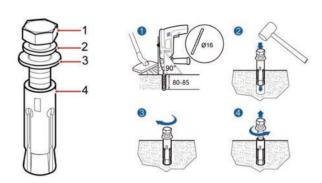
IES-R12 Rack fixed hole size drawing (unit: mm)
